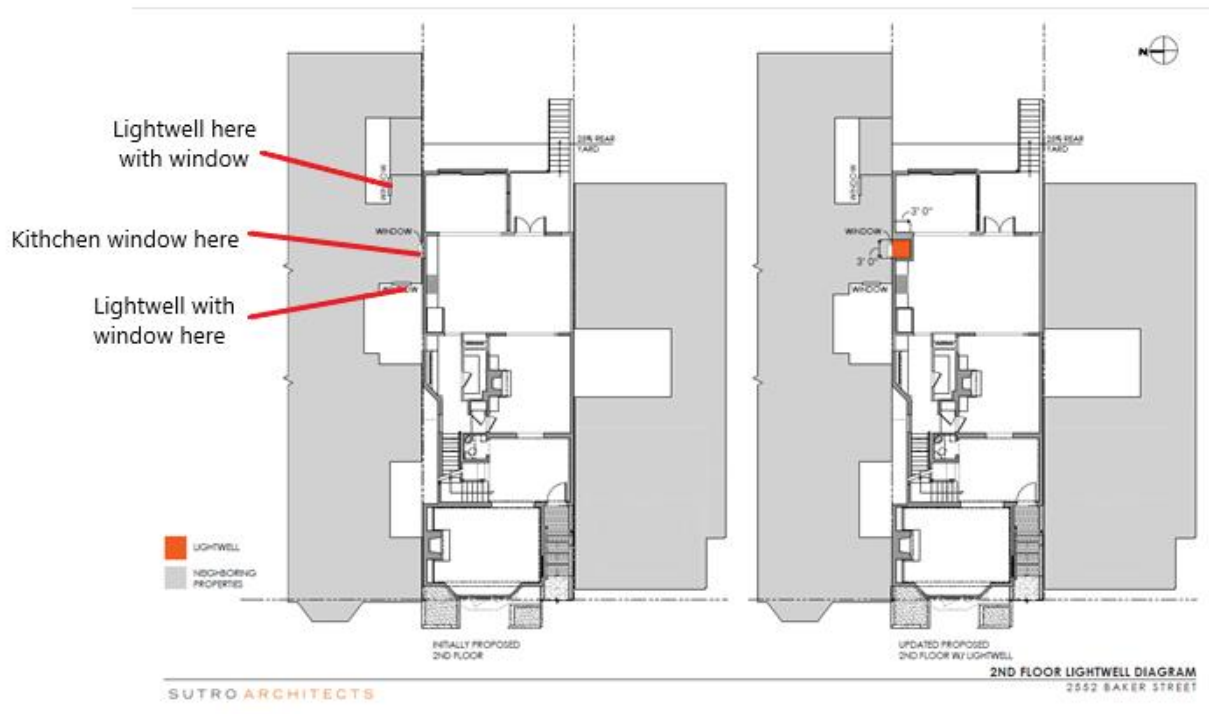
LIGHTWELL ADDED TO 2ND FLOOR TO PROVIDE SETBACK FROM PROPERTY LINE WINDOWS NEXT DOOR (THE LIGHTWELL WAS ADDED TO THE 3RD FLOOR AND ATTIC LEVELS AS WELL)
